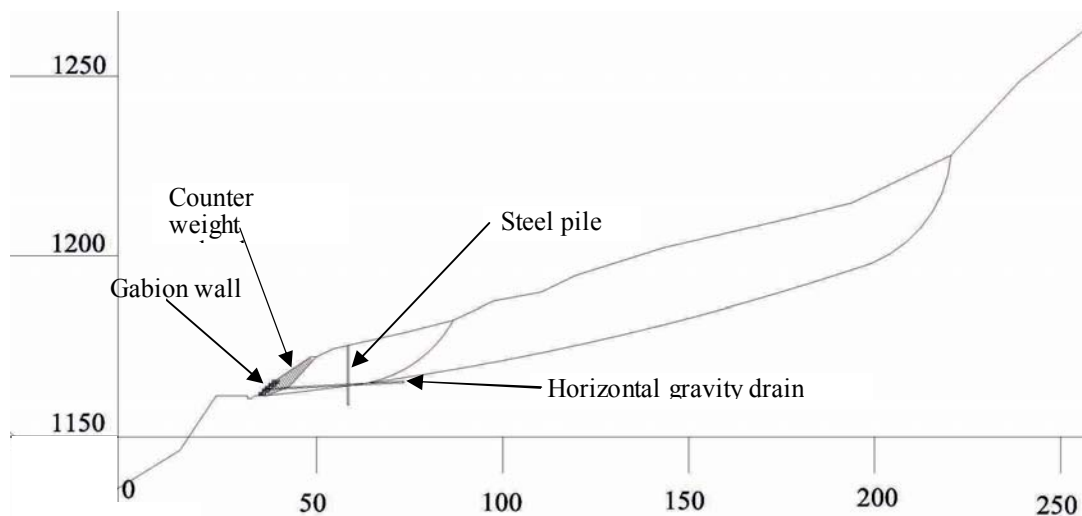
Example of Countermeasure against Colluvial Deposit Landslide using Horizontal Gravity Drains and Counter Weight Embankment
